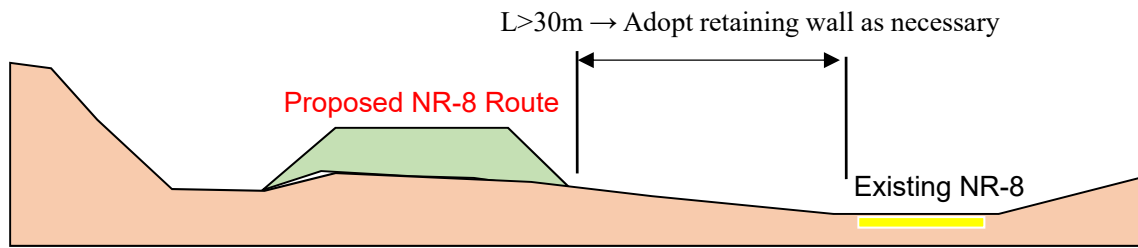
A-A Cross section (Parallel to NR8 Route)
